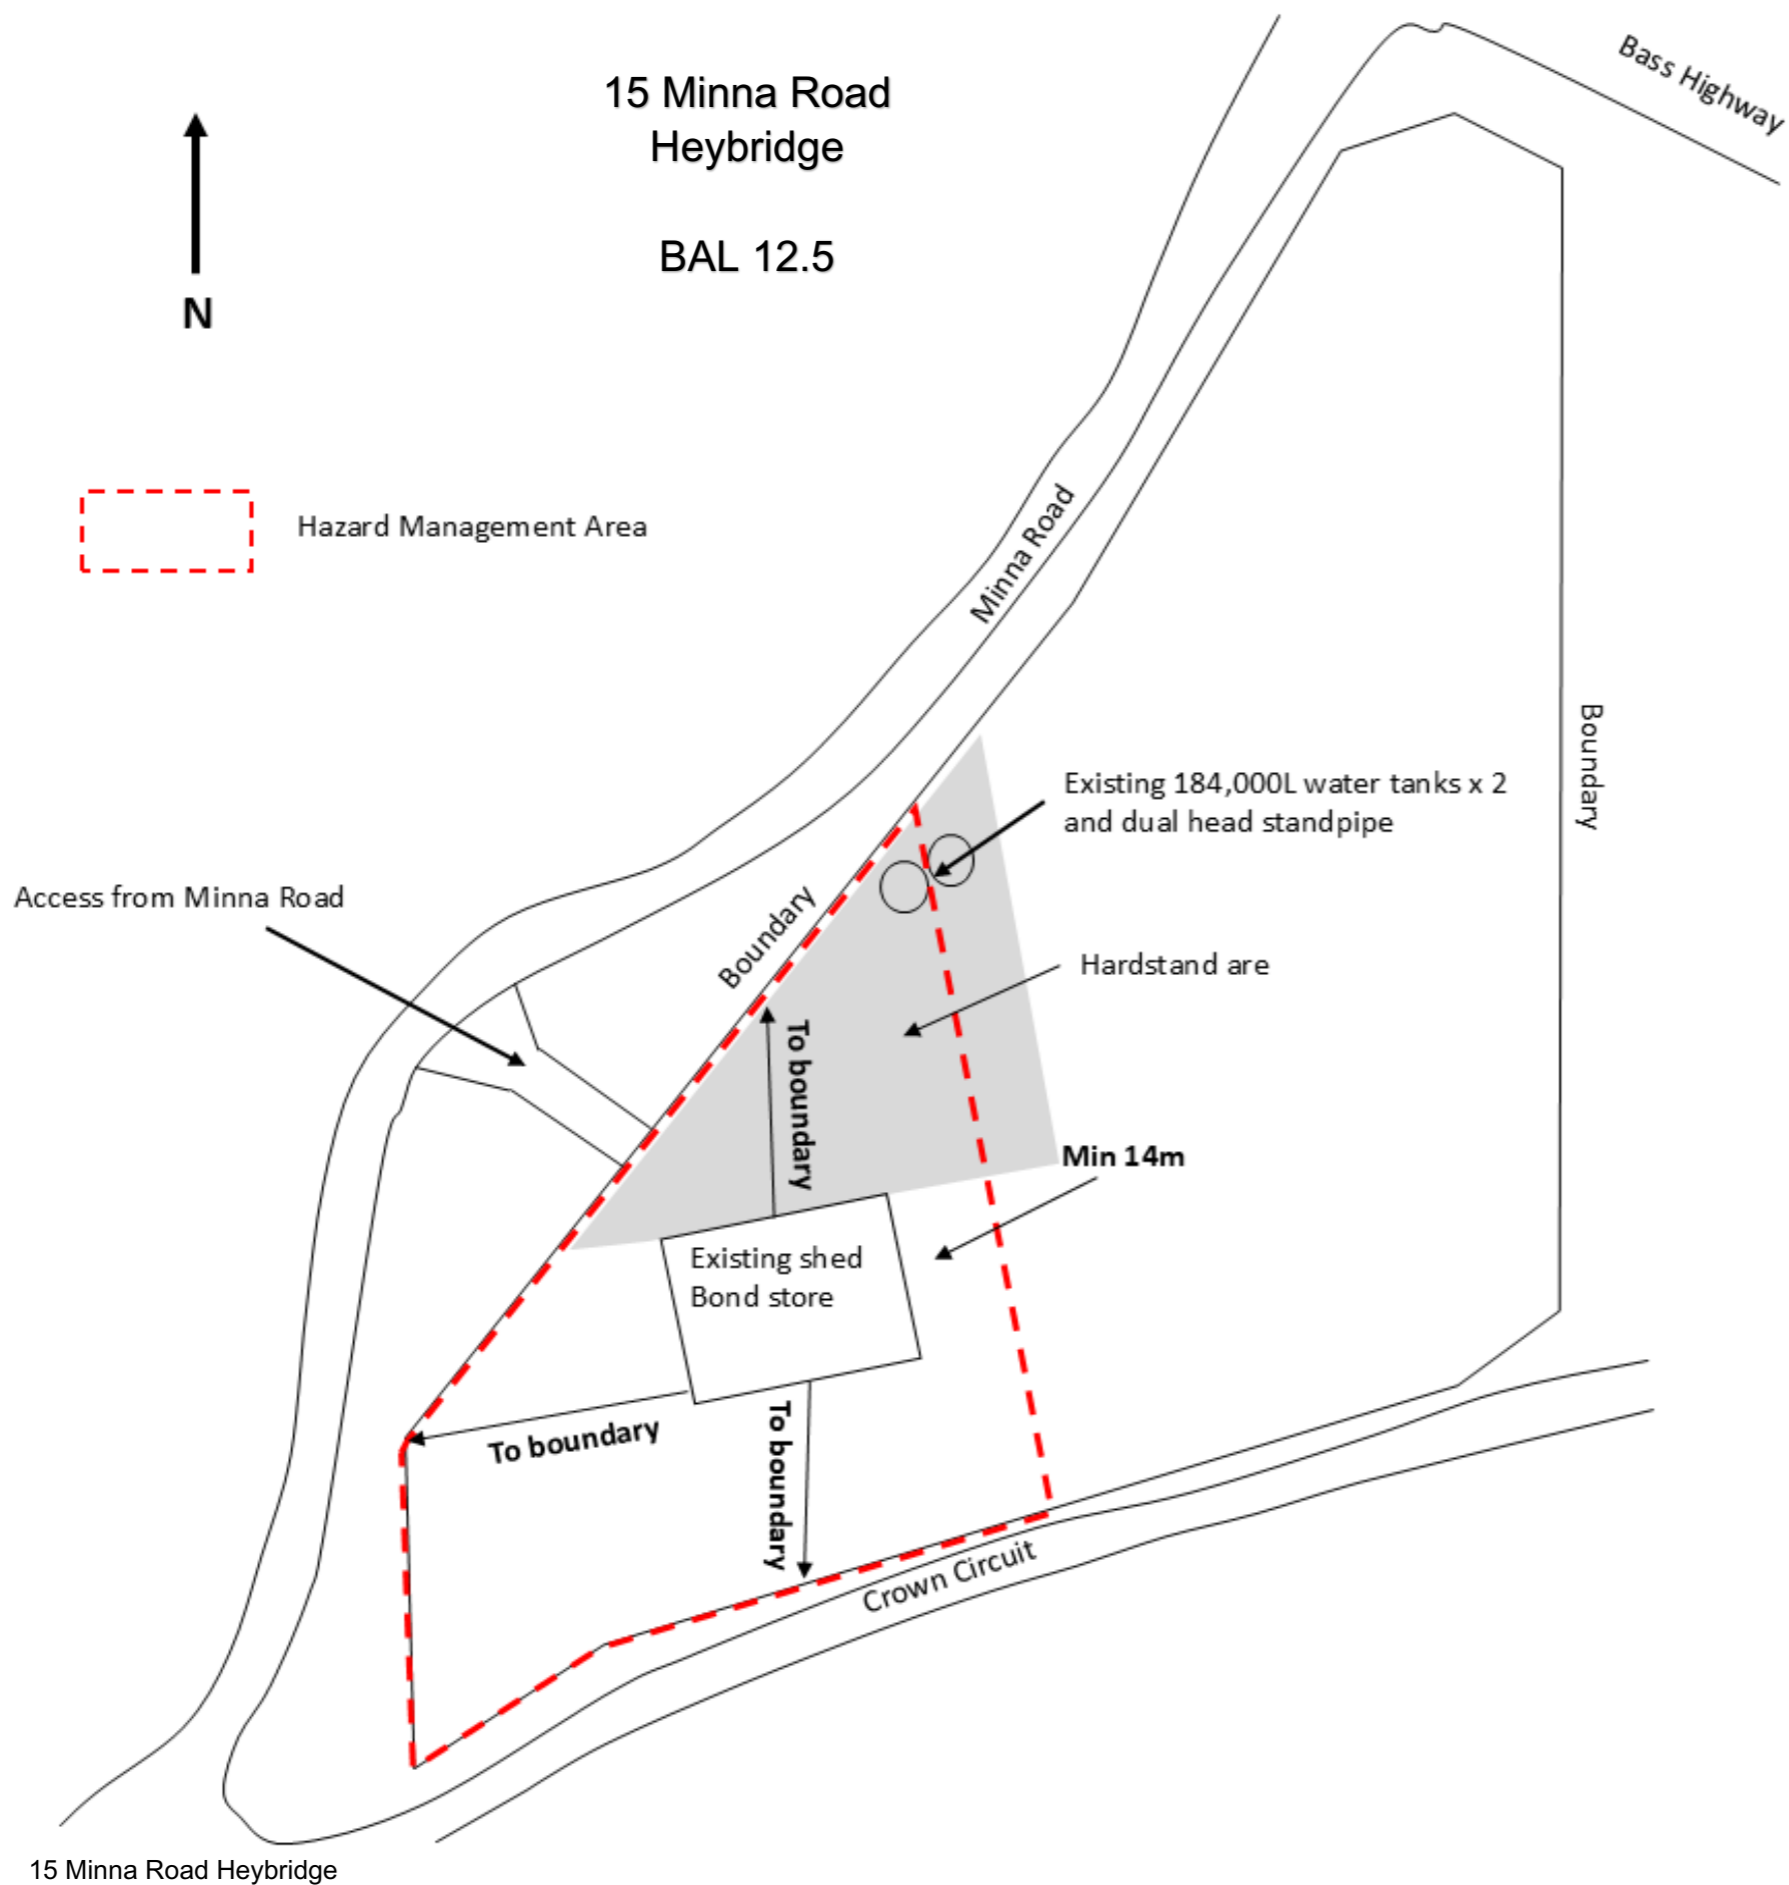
Proposal Plan as approved January 2023 (Source: Development Permit DA2022-80)
